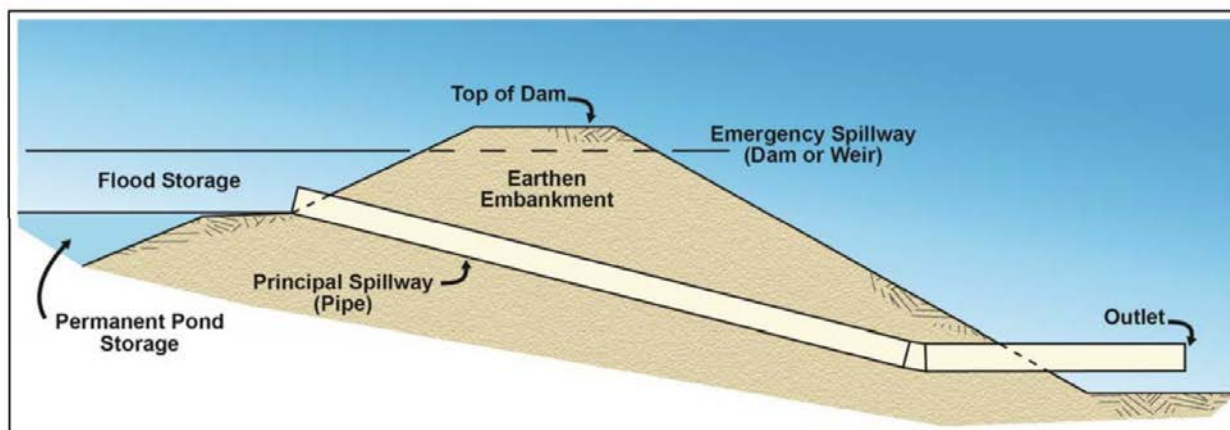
Schematic of a pond constructed to provide flood storage.
